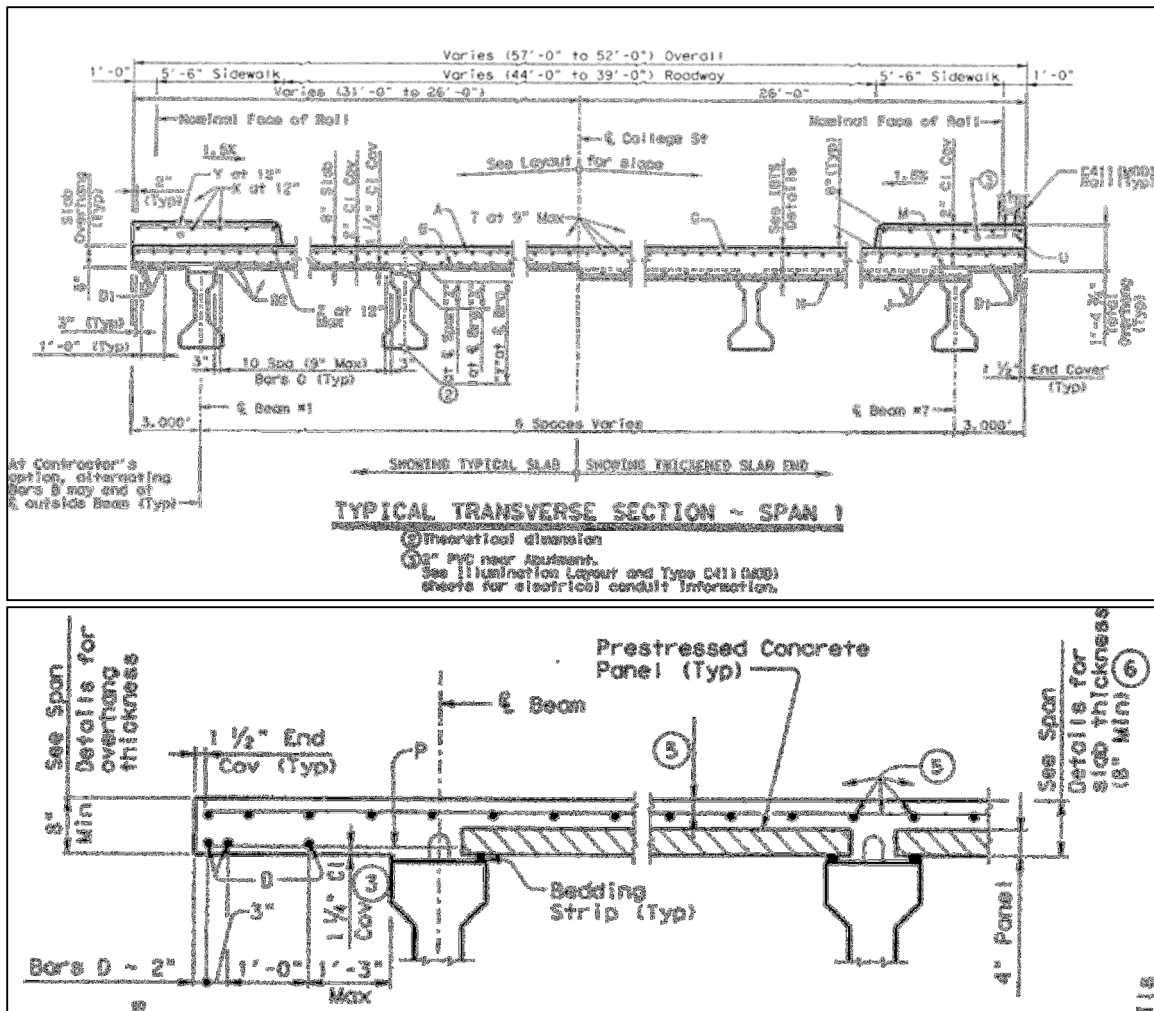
Cross section of Georgetown bridge deck: Summer Pour.
